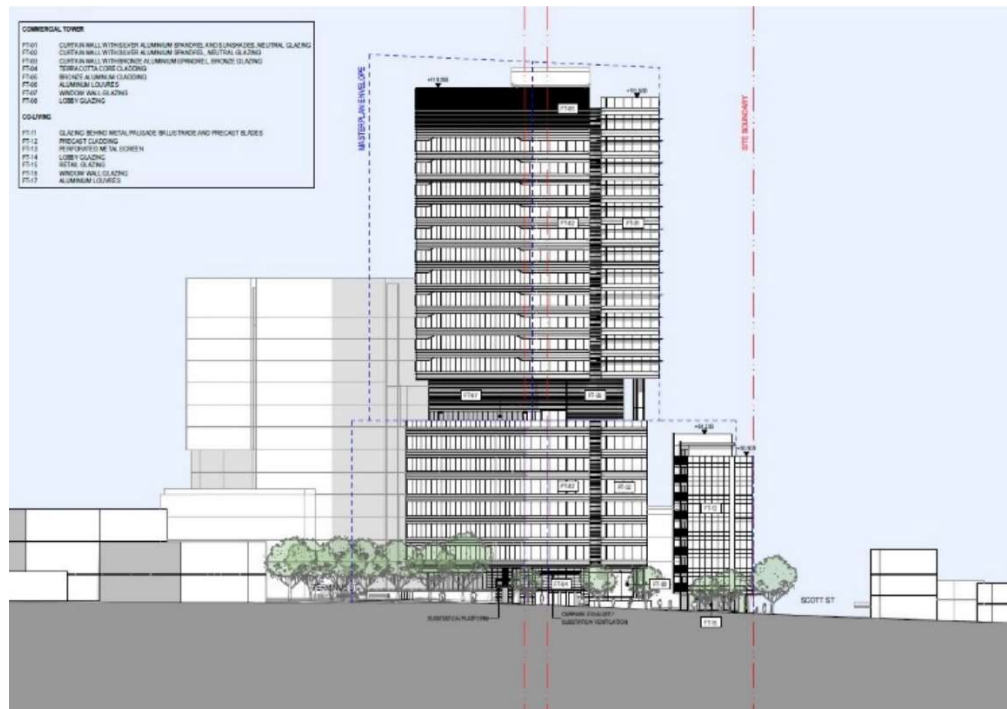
Eastern elevation of the 22 storey commercial building and the adjacent 9 storey boarding house. This image includes the line of the approved building envelope (blue dashed line) within which this more detailed design has been developed. (Source: FJMT Architects)
